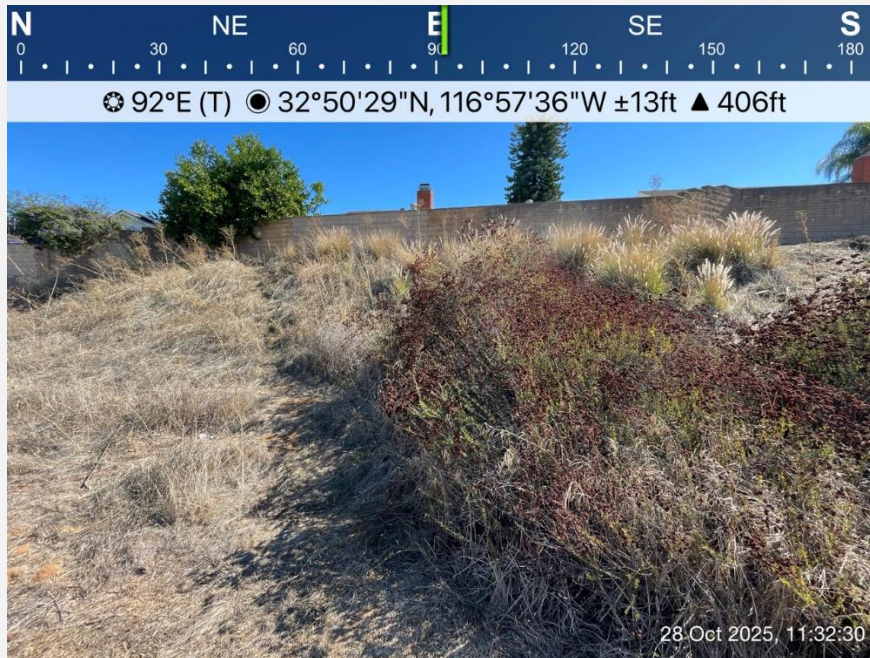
Work Location 187+30; facing east. October 28, 2025.
